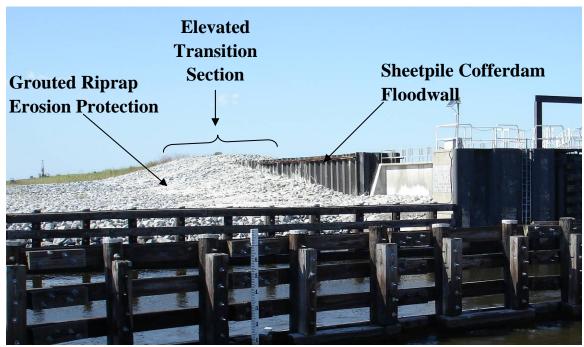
Bayou Dupree Gate, October 2008, northwest flank, protected side, looking north (L. Wooten)
